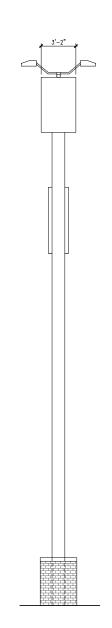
EXHIBIT D EXISTING WAL-MART POLE SIGN WITH PROPOSED SIGN CABINET
